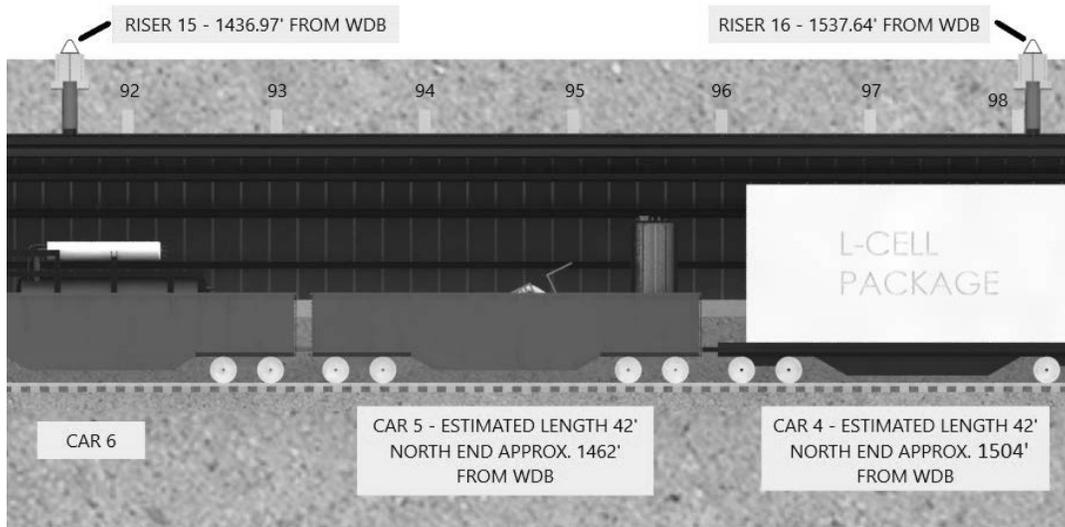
Riser 16 to Riser 16 Tunnel Section.
